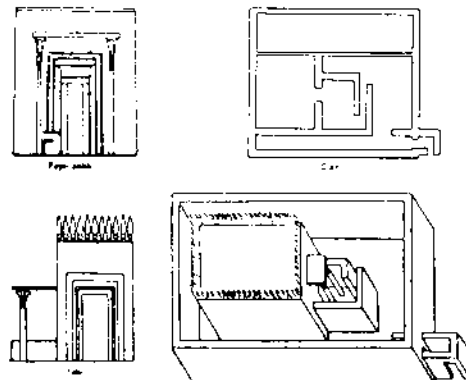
Drawings from VIth dynasty tombs representing an embalming hut (two in elevation, one in plan) and restored axonometric view (Ricke).
